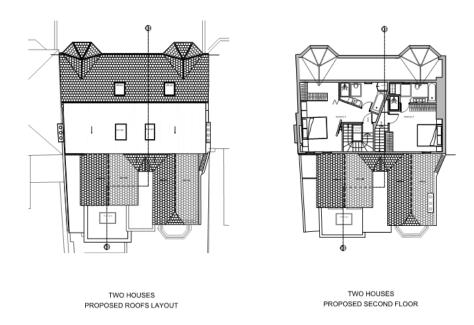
Proposed second floor plan and roof plan 2022/0760/P
